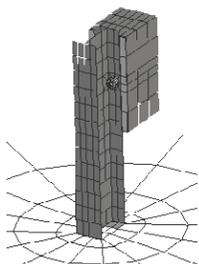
Finite Element Model of Steel Post with Wooden Blockout
